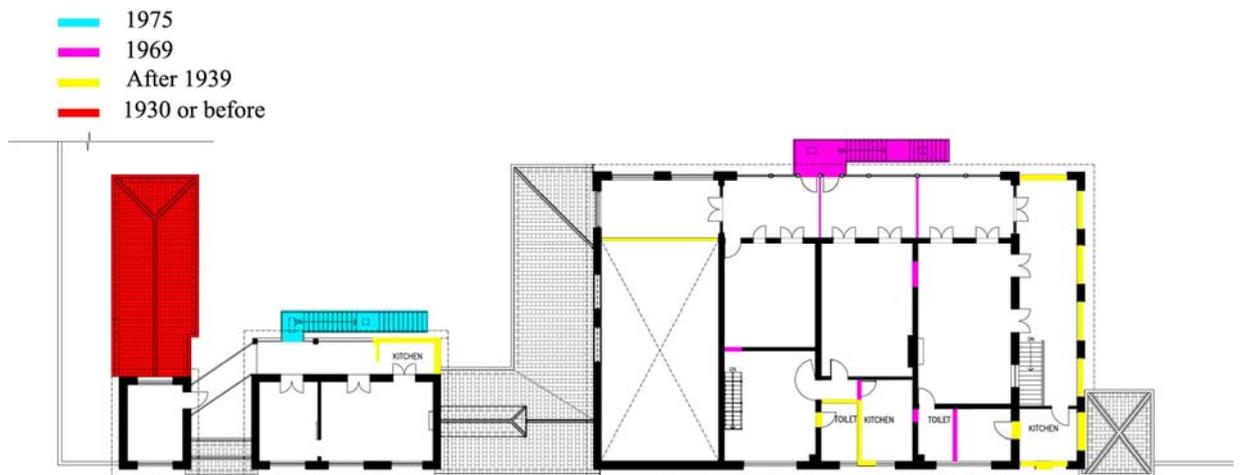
Possible first floor plan of the former clubhouse at No. 12 Oil Street after the 1969-1975 conversion.
